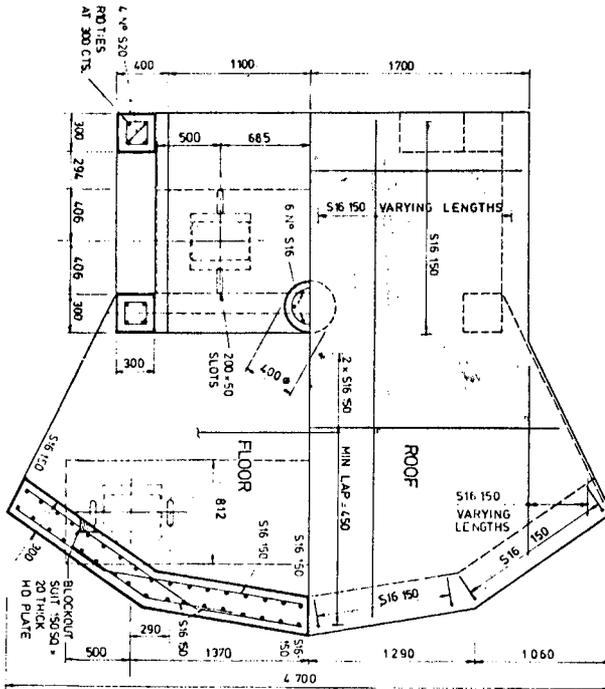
SPLIT PLAN OF OUTLET UNIT
